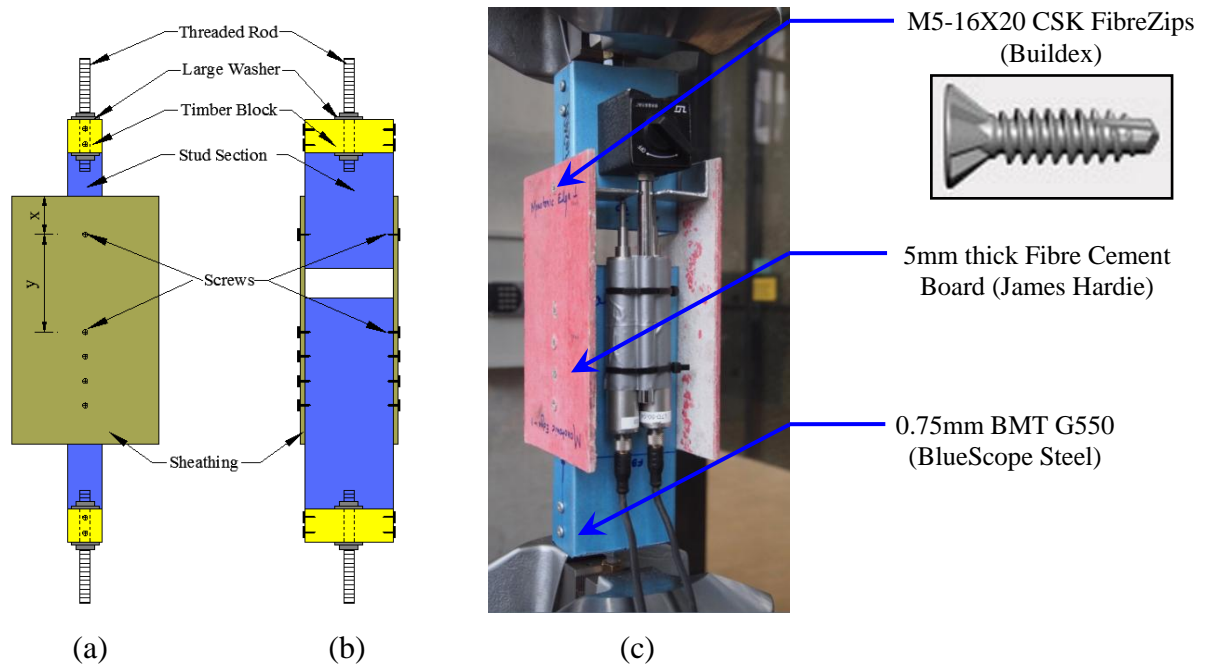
(a) Side view of specimen (b) Back view of specimen (c) Photograph of loaded specimen showing position of instrumentation (2 LDTs)
